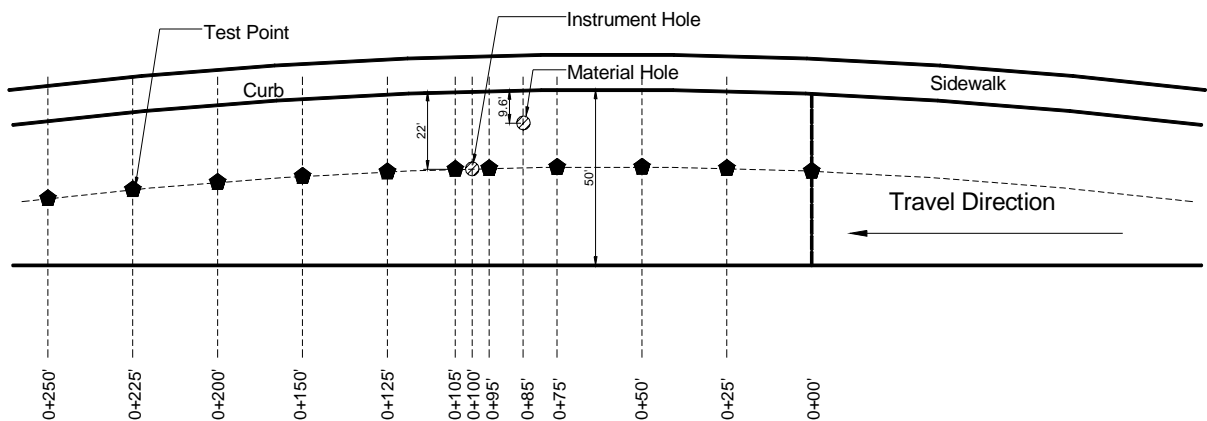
Layout of test point, instrumentation and material holes for test section 3.
